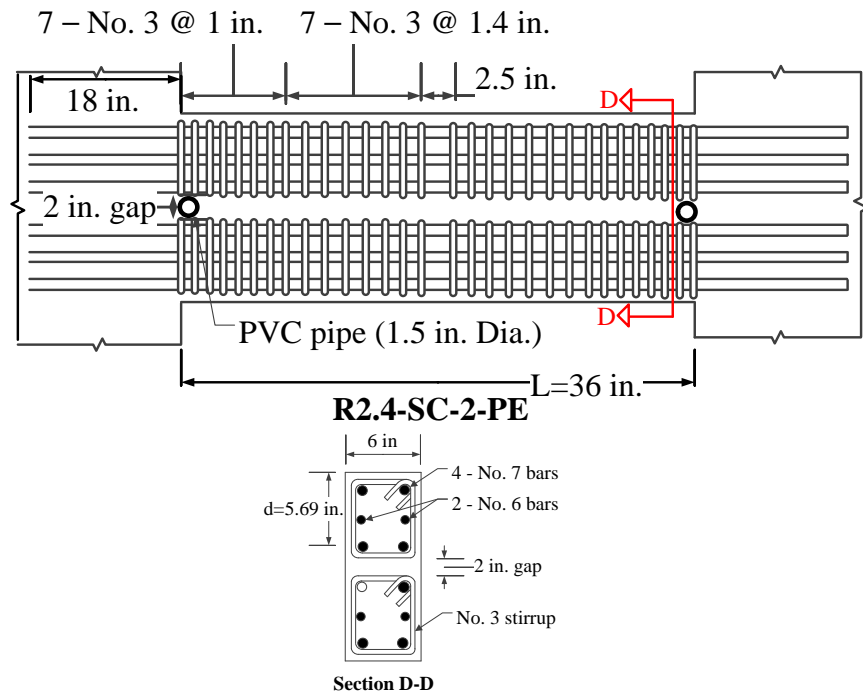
Reinforcement details of R2.4-SC-2-PE
